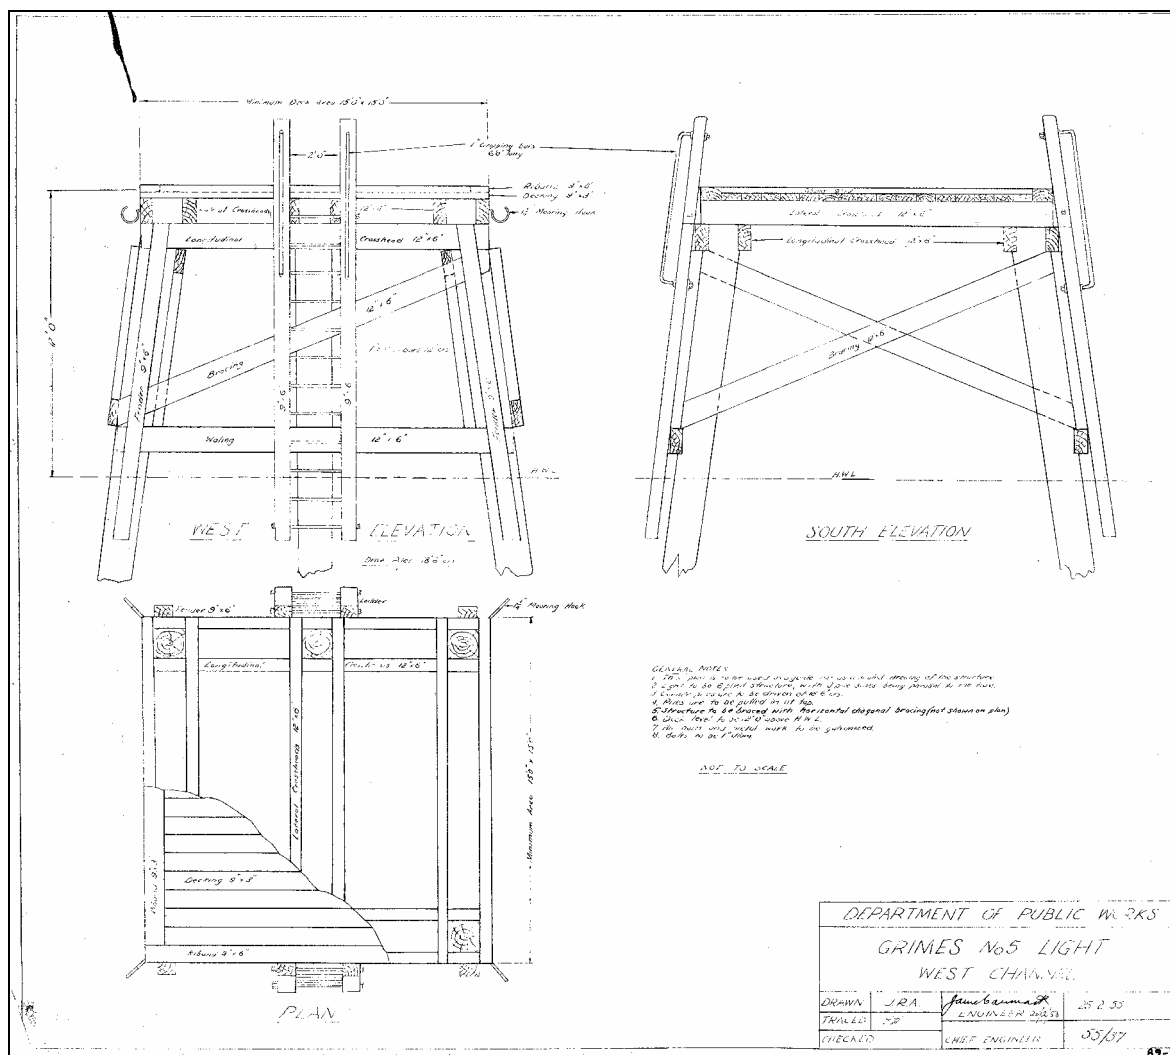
38: Plan of Grimes #5 West Channel Light (DPW 55/37:1955 plan, QMM Collection).
